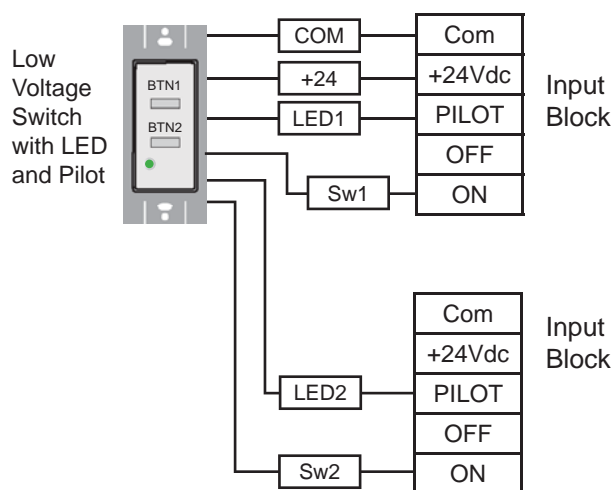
Typical LV Switch 2 Btn with Locator Connections
